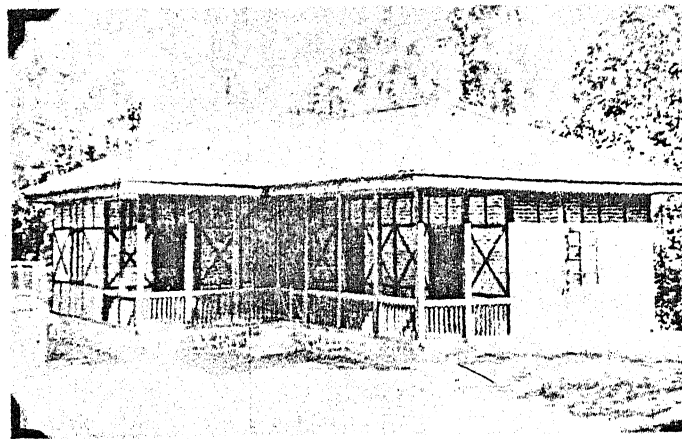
A TYPICAL HOUSE IN KASHMIR (INDIA)
